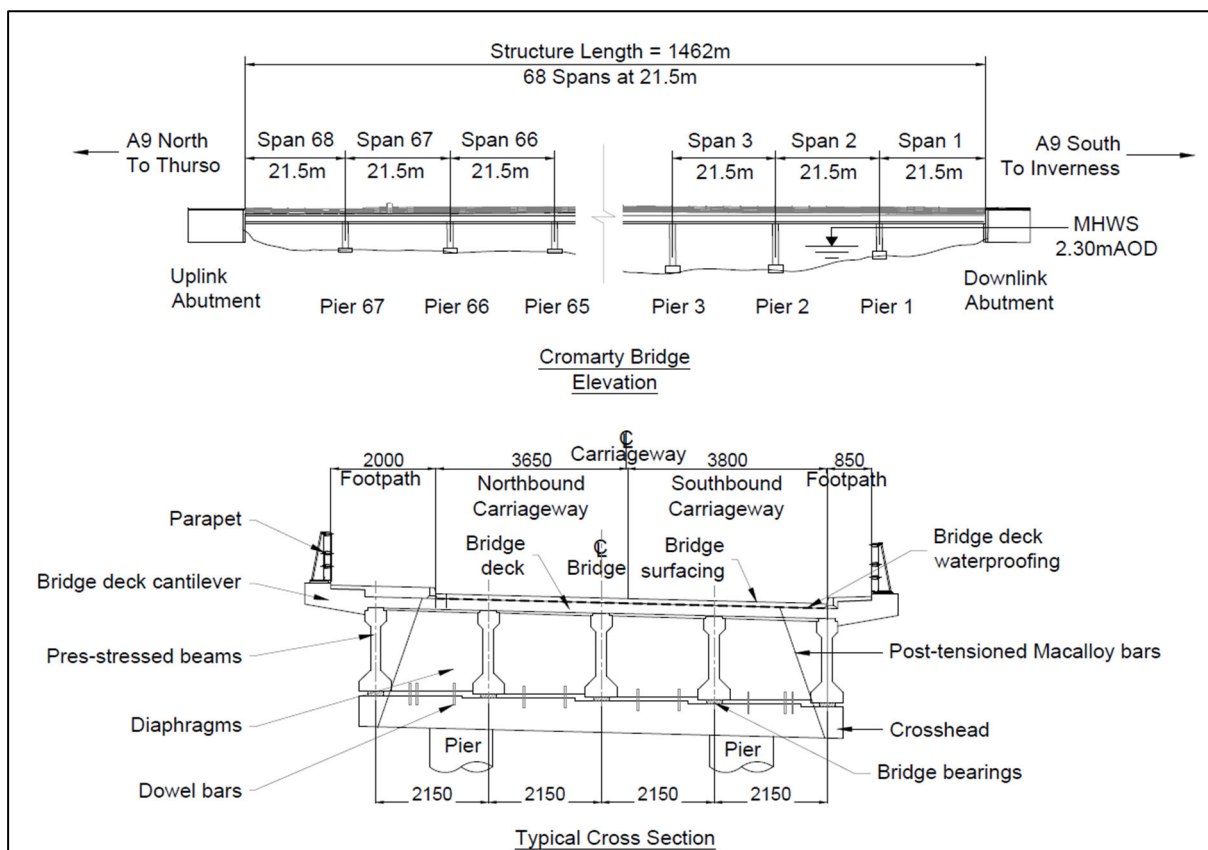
, A9 Cromarty Bridge - Typical Elevation & Cross Section
